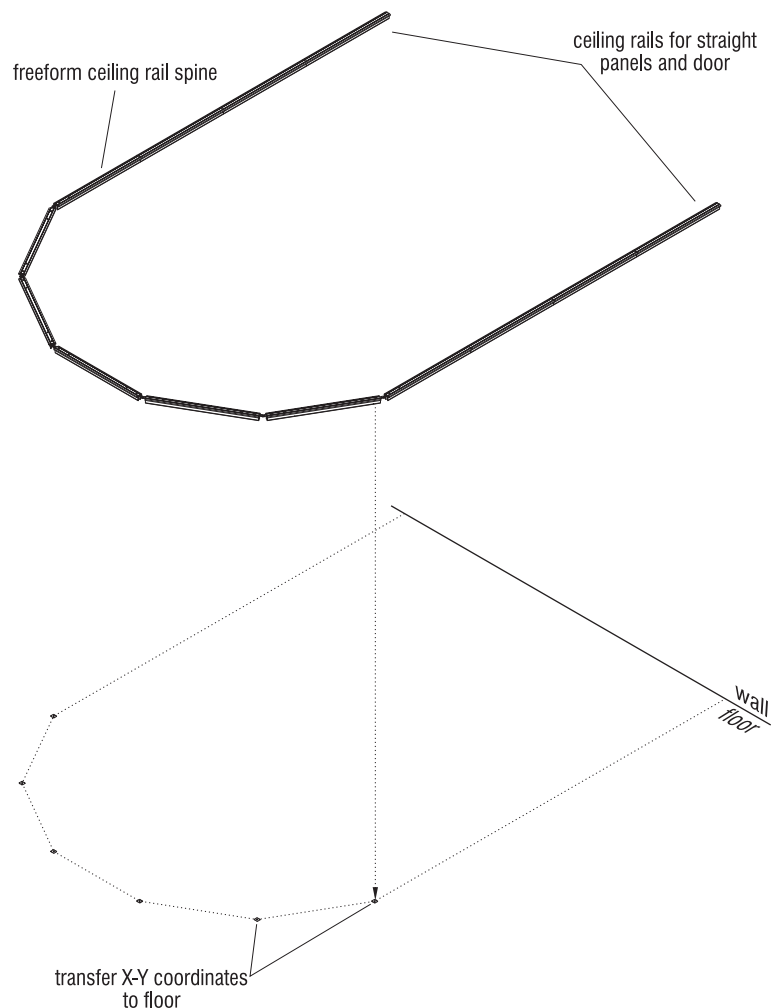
Floor Channel Alignment Check and Marks for Installation
